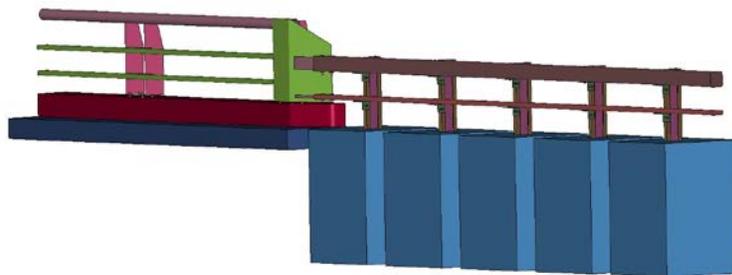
Model of Box Beam Transition to C2P Bridge Rail
